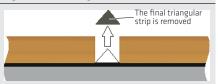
$\,$ Fifth cut using a scraper along the bottom of the joint
